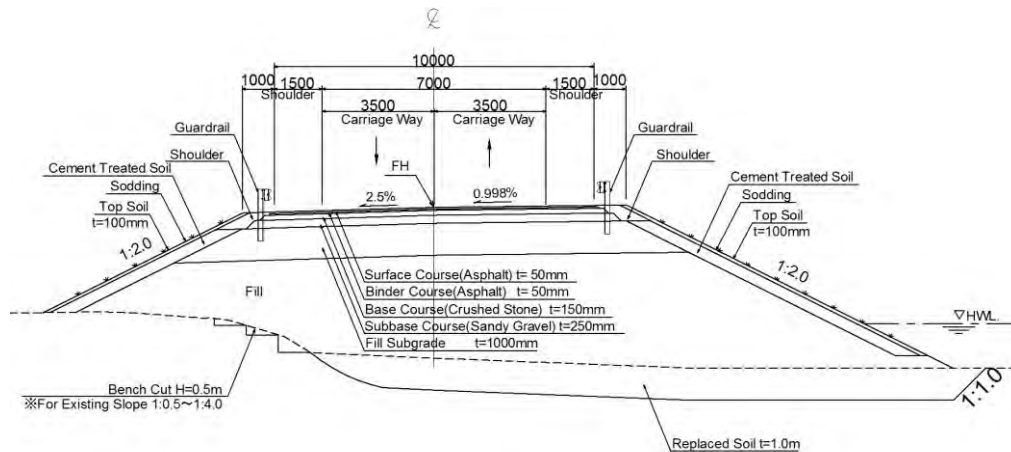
Typical Cross-section of Approach Road (Reconstruction Near the Existing Bridges)
